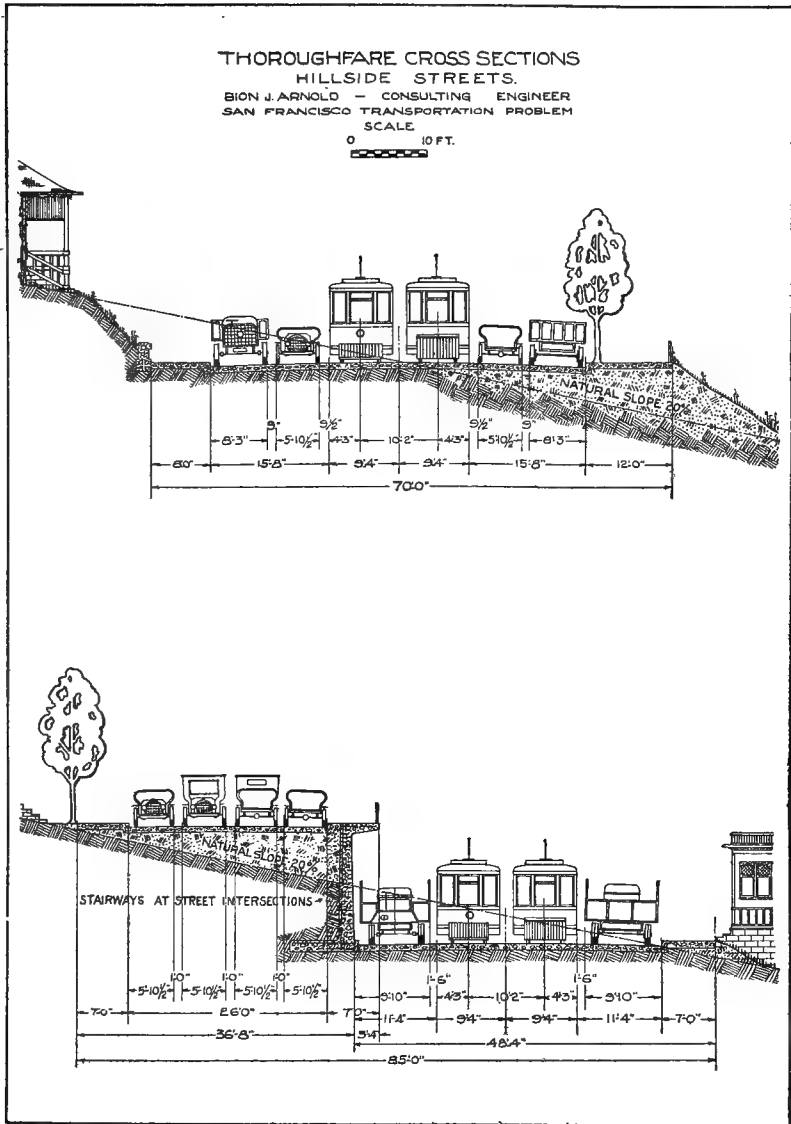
HILLSIDE STREET, PLANS A AND B.
